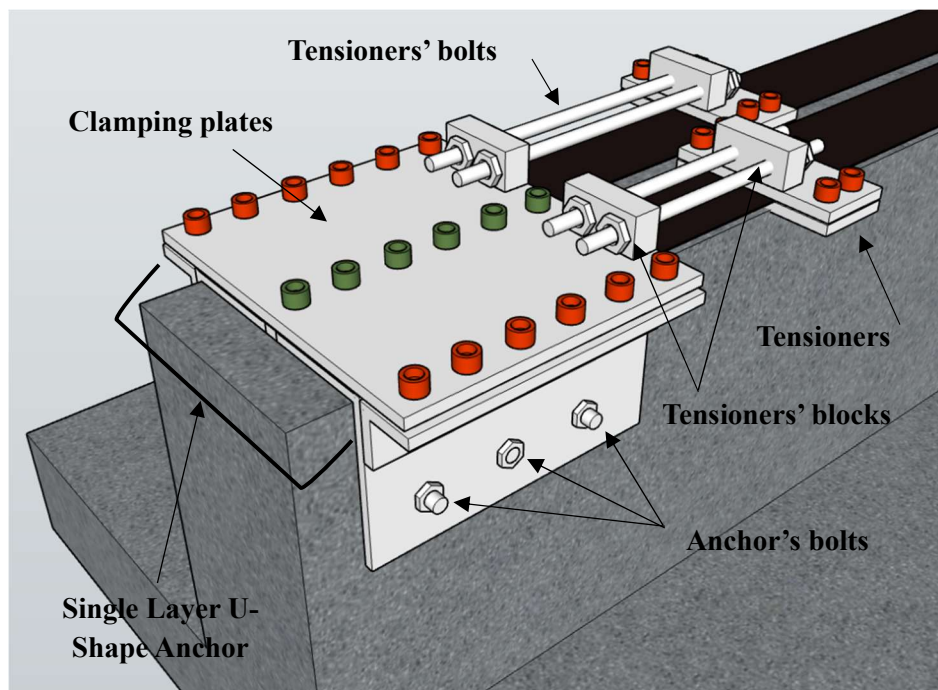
Upside Down 3D Drawing of the Single Layer U-Shape Anchor
